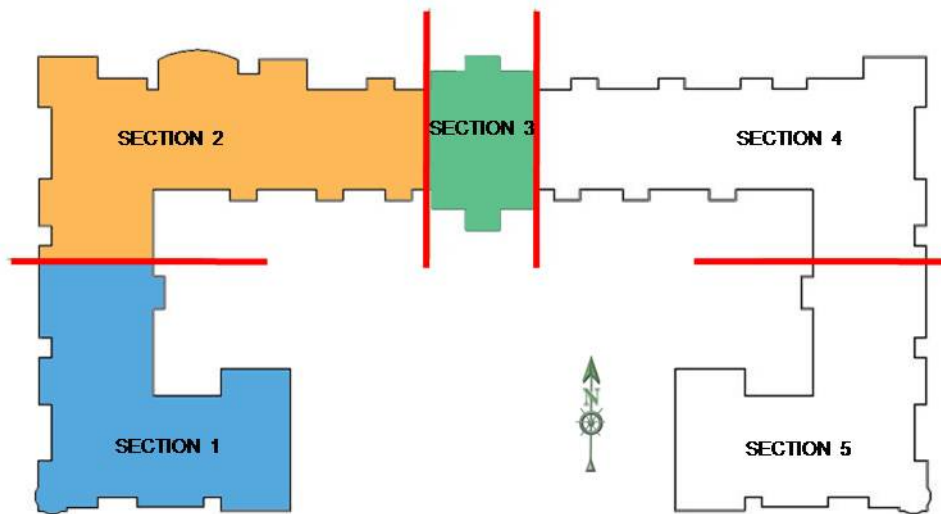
Shows typical floor plan for levels 2-6 and expansion joints indicated by red lines.
